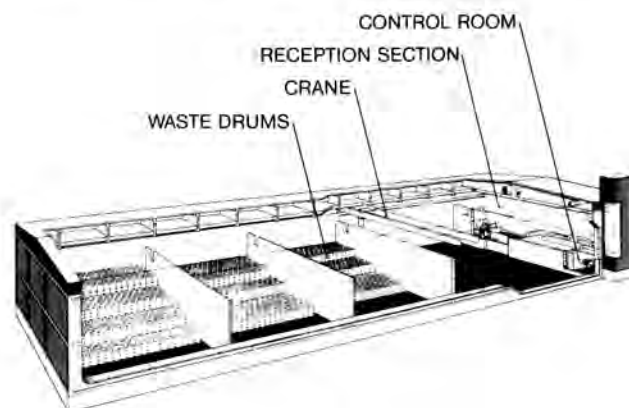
Interim storage facility for bituminized wastes at Olkiluoto Power Plant.
